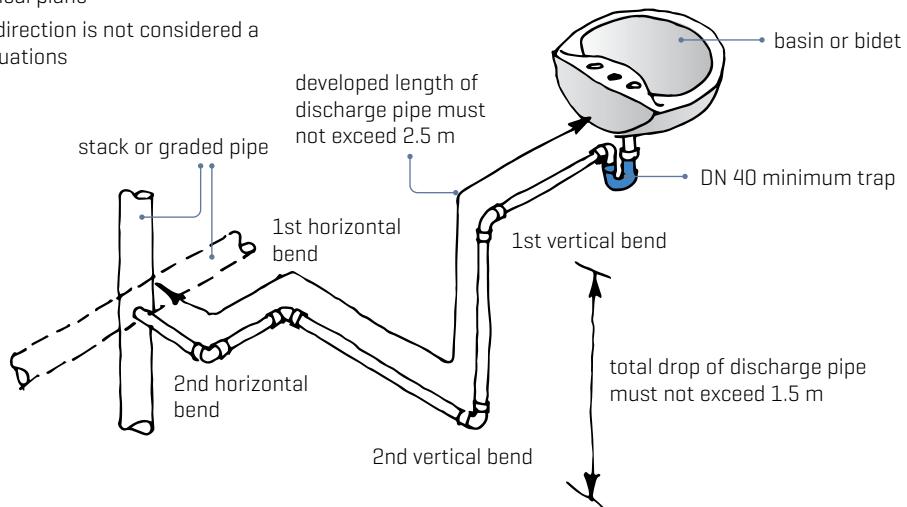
Connection of basins and bidets to a branch pipe or stack.
